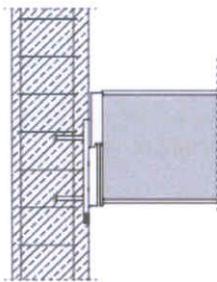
Steel beam connected to concrete wall with anchor plate and shear studs.
